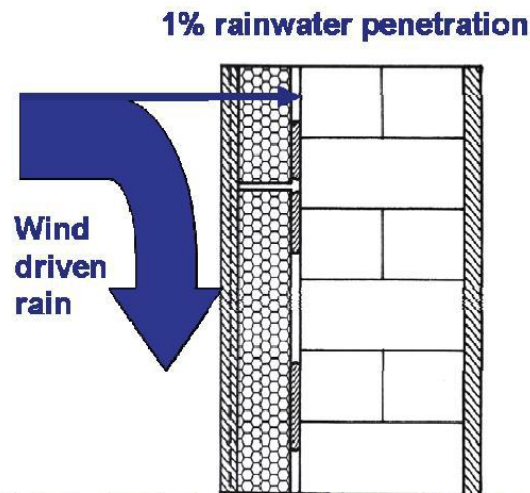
Schematic plot of a typical masonry wall with External Thermal Insulation Composite System (ETICS) including the deposit site for rainwater penetrating through leaks at joints and wall connections.
